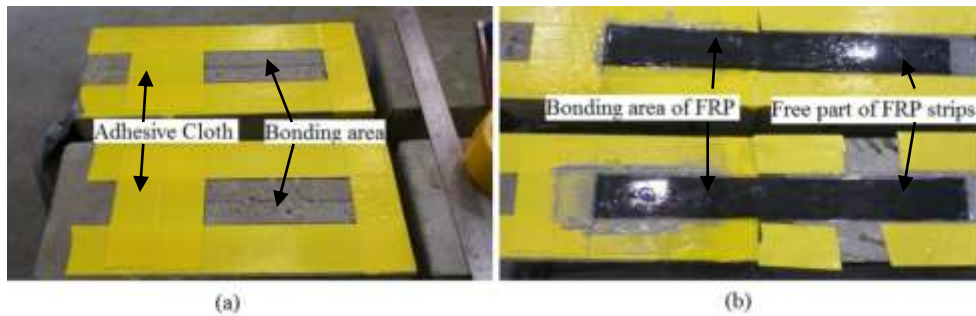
Preparation of FRP bonded concrete joints (a) treatment of concrete substrate; (b) applying FRP sheets using wet lay-up method
